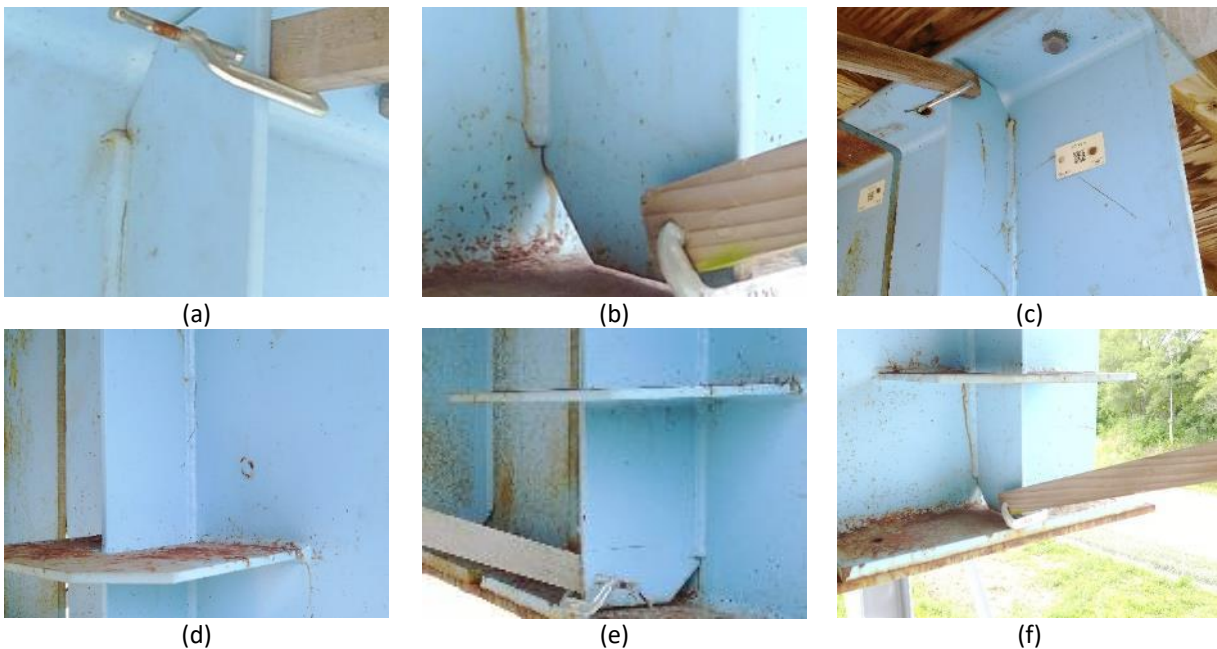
DJI Mavic inspection images of a girder specimen : (a) top-left fatigue crack, (b) bottom-left fatigue crack, (c) scratch on top-right, (d) rust on top-right side of the horizontal stiffener, (e) rust and weld notch on bottom-right, (f) scratch on bottom-left
